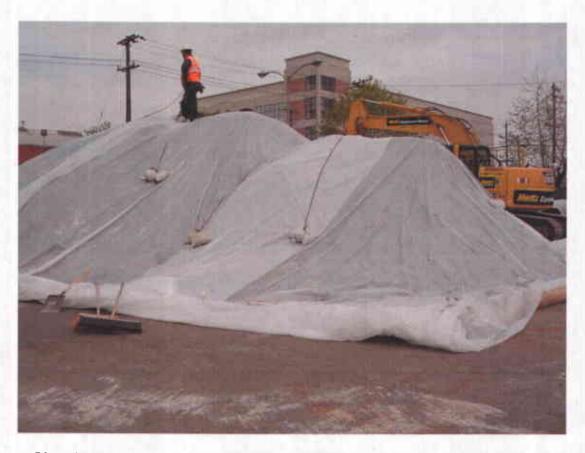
Stockpile, covered with Visqueen sheets, weighed down with sandbags and bordered with straw wattles (Facing East; 4/25/2007)
